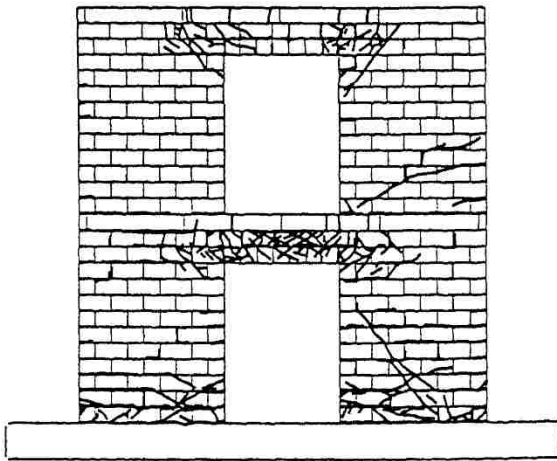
Two-Story, Fully Grouted Wall Crack Pattern (Klingner and Leiva 1992)
